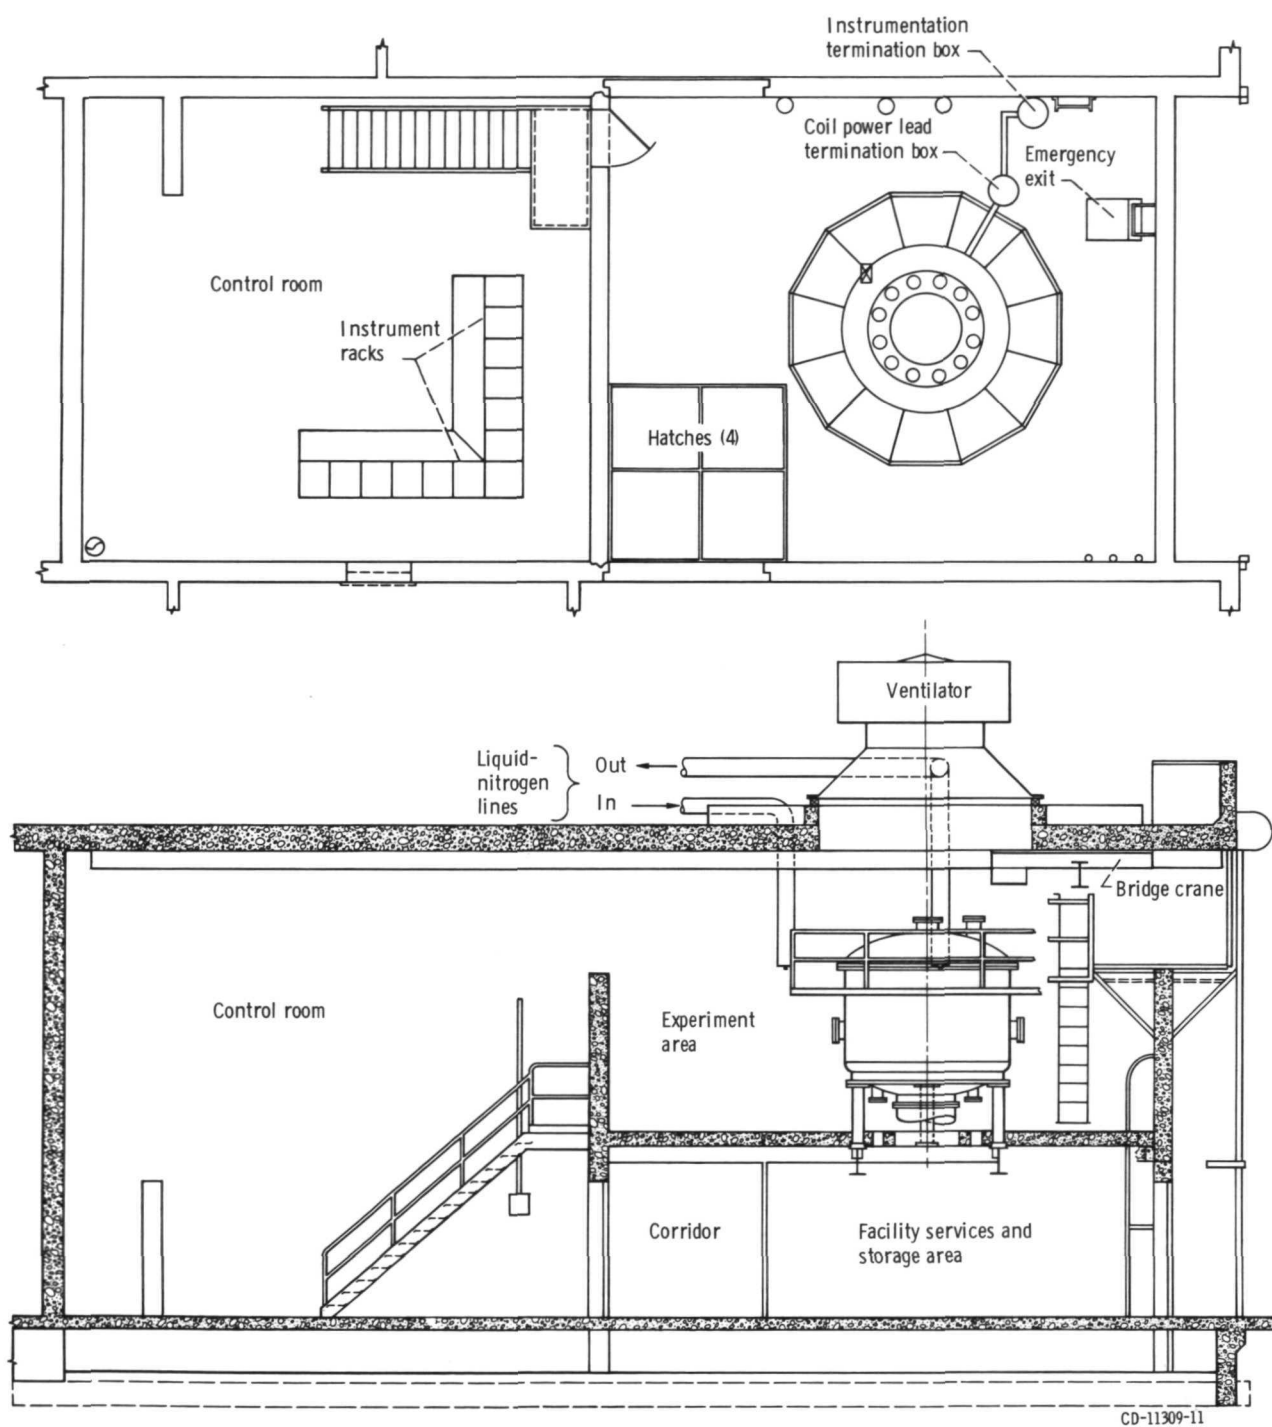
Plan and elevation of superconducting bumpy-torus magnet facility.
